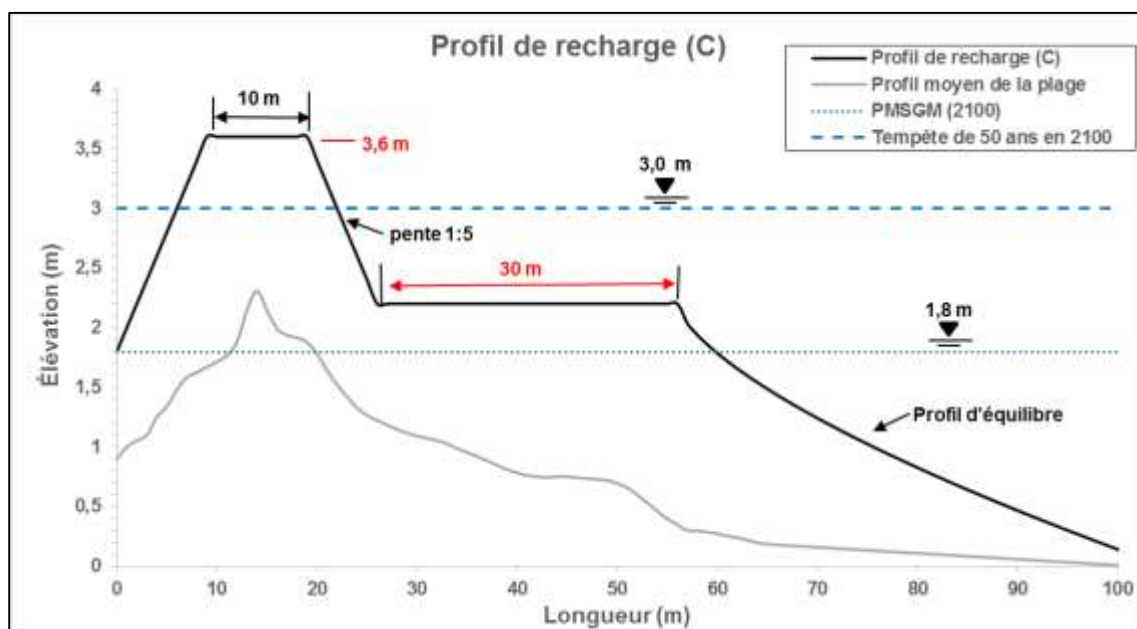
Hypothetical beach profile that would be built in 2055. Dune elevation is 3.6 m with a 10 m crest and 1:5 slopes. The dry beach is 30 m wide. Average profile shown is hypothetical and used for illustration purposes only (from Hébert and Aubé 2016).
